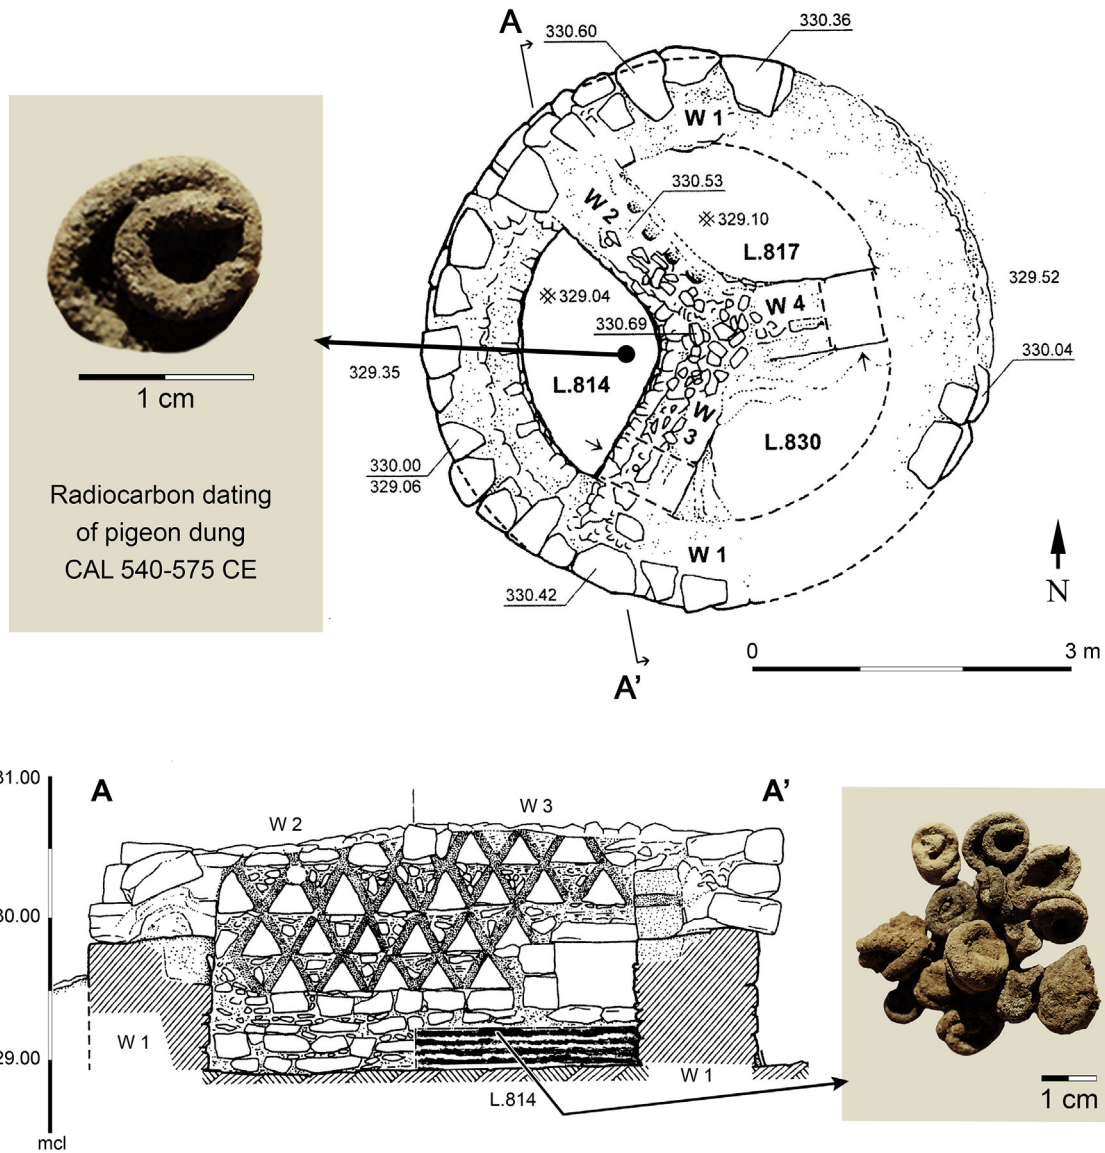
Plan and sections of Pigeon Tower No. 1, including the layer of detritus (L-814) at section AA.
